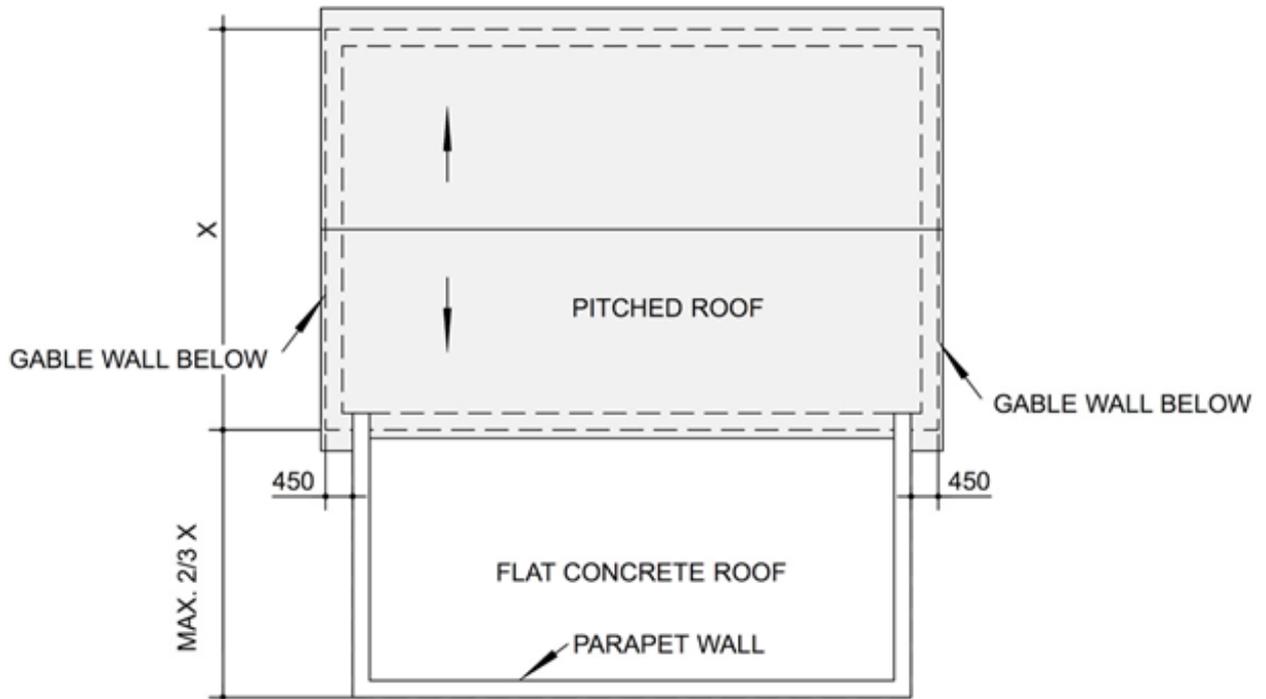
Typical arrangement of a flat roof situated to the side of a pitched roof showing parapets on 3 sides, set back of walls and maximum width relationship to the adjoining pitched roof building.
